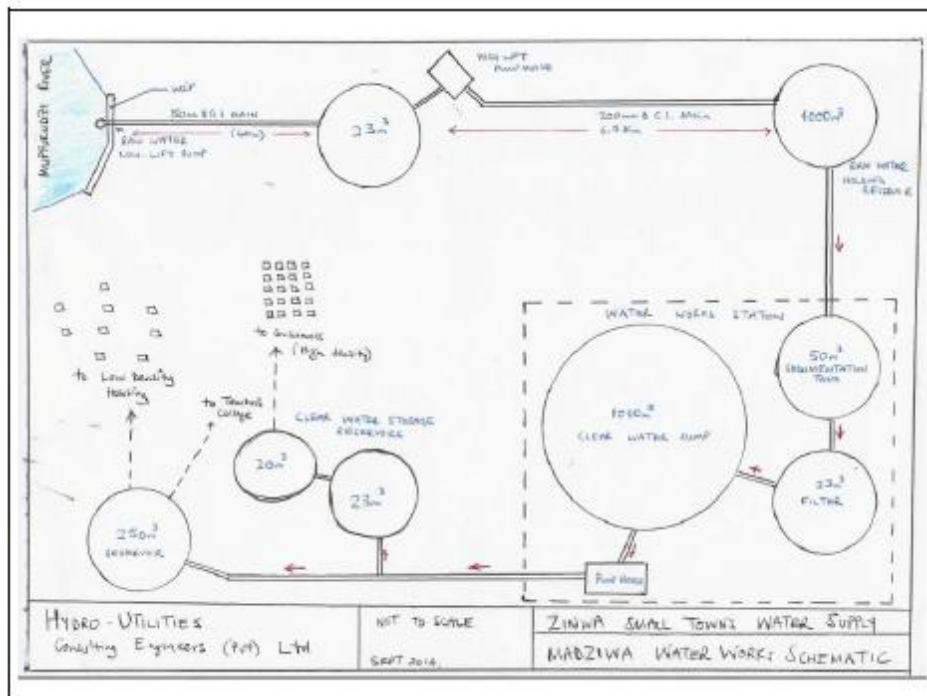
Schematic layout of Mazdiwa Trs' College Water Supply
